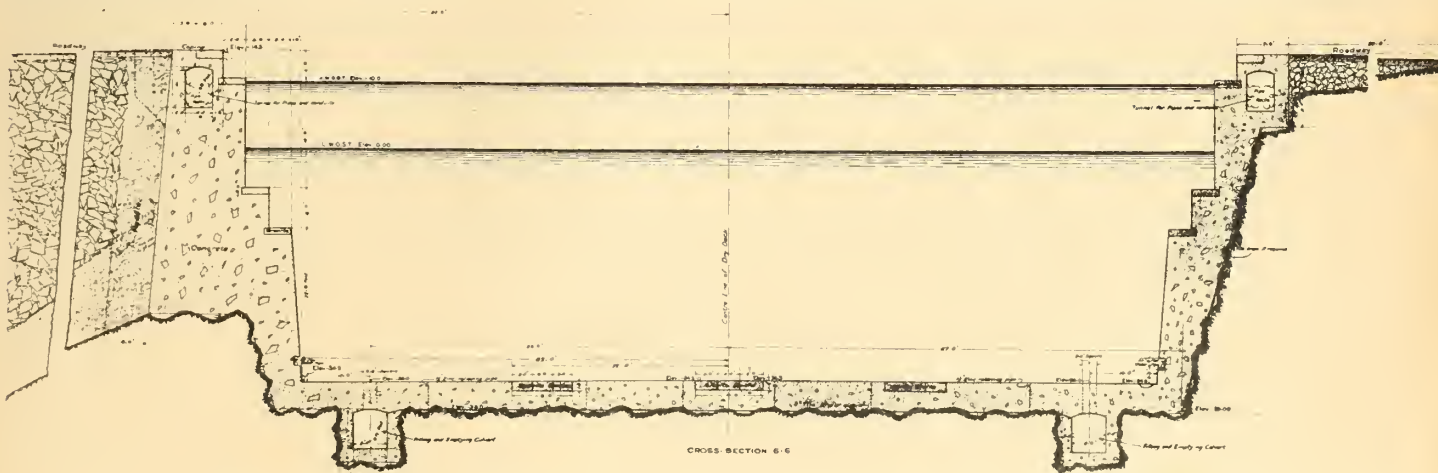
Esquimalt Drydock Typical Cross-section Through Inner and Outer Berths.
